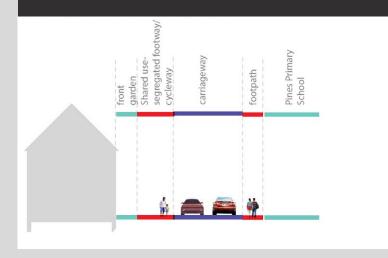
ILLUSTRATIVE SECONDARY CARRIAGEWAY STREET SECTION
